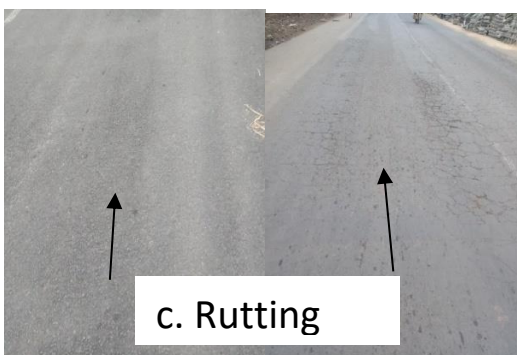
rutting: Defects on RTI along the Olembe-Nkometou 1, stretch of road.
